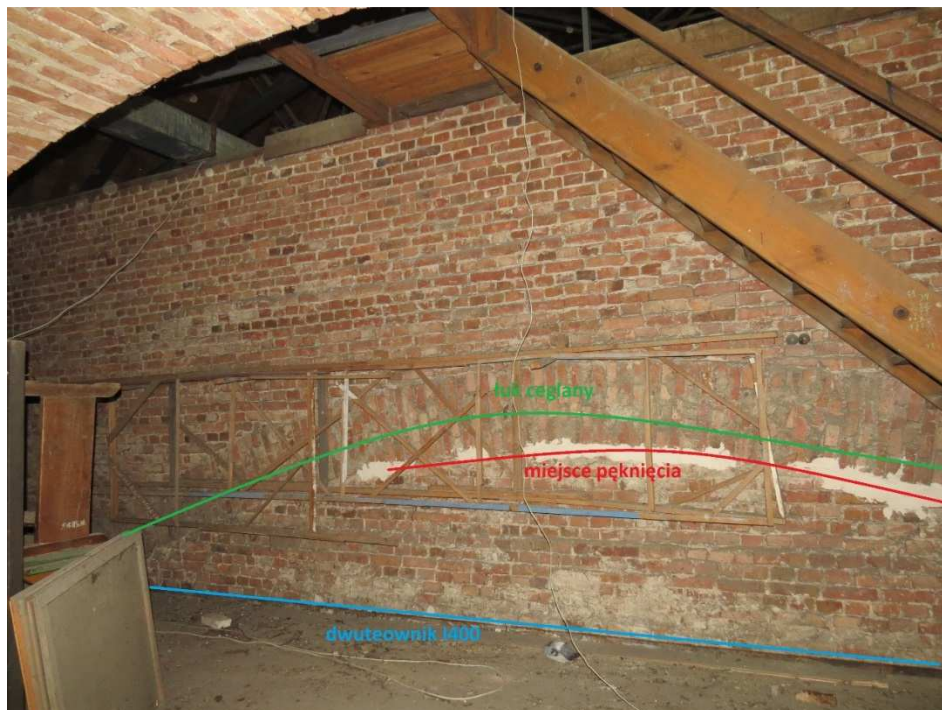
Place of crack – view from inside the church (Author, 2016)
